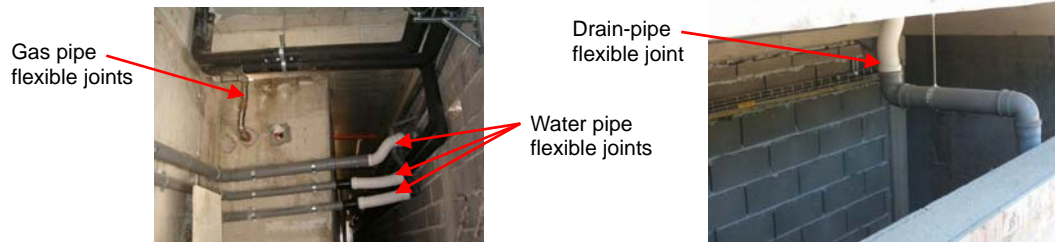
Details of the flexible joints installed on gas and water pipes, and drain-pipes
